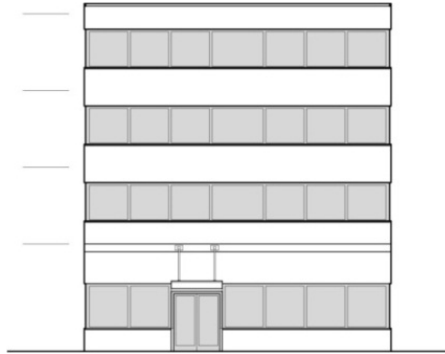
Unacceptable Façade Style in the Historic-Commercial Sub-District
